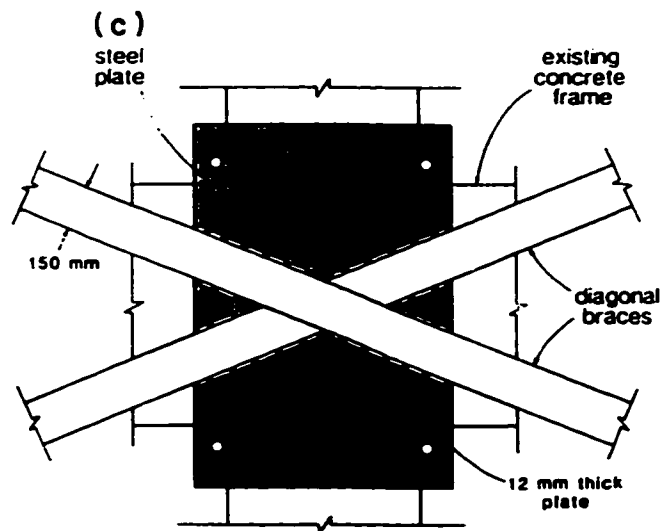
Details of a connection between RC frame and an external truss system. (Mitchell and Dandurand, 1987)
